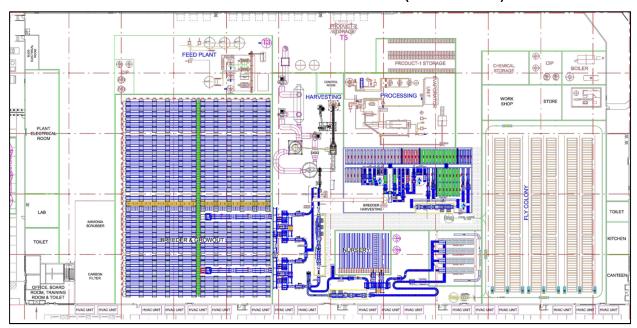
PROPOSED FLOOR PLAN (BUILDING #1)
